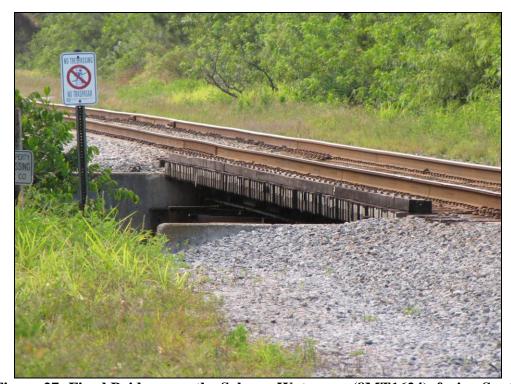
Fixed Bridge over the Salerno Waterway (8MT1624), facing South
